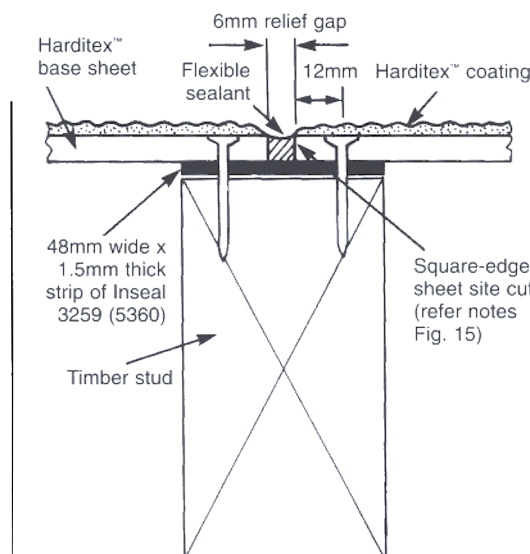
VERTICAL BUTYNOL INSEAL RELIEF JOINT (ALTERNATIVE 1)
